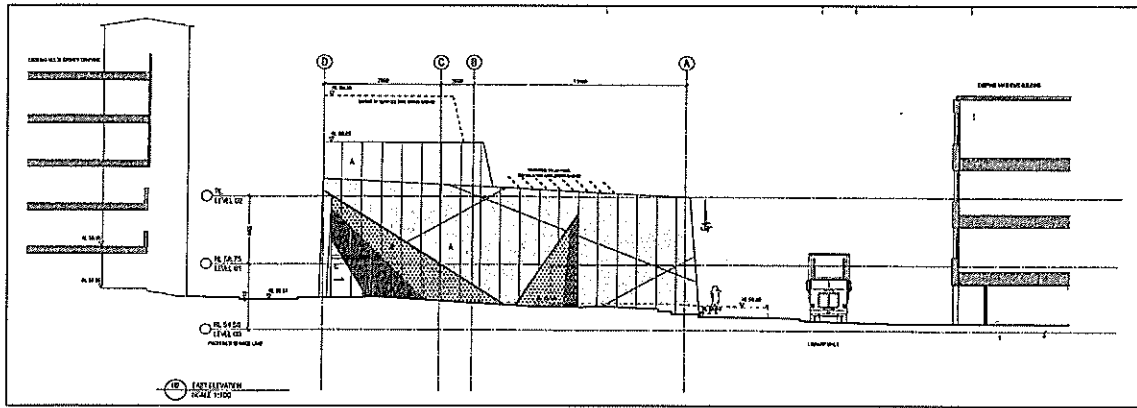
Proposed east elevation (fronting remaining open space carpark)
